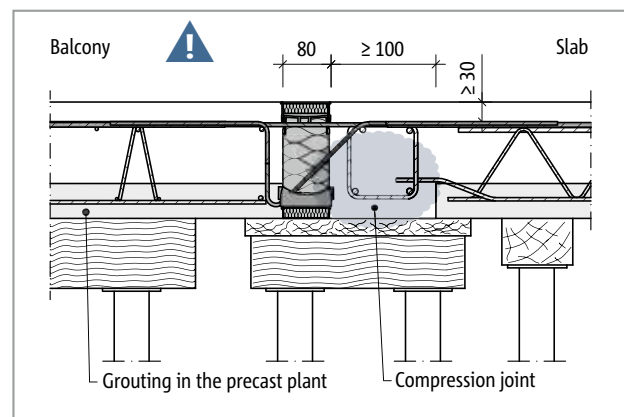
Schöck Isokorb® T type K/KF: Indirect support, installation in conjunction with prefabricated slabs (here: $h \leq 170$ mm), compression joint on the floor side
